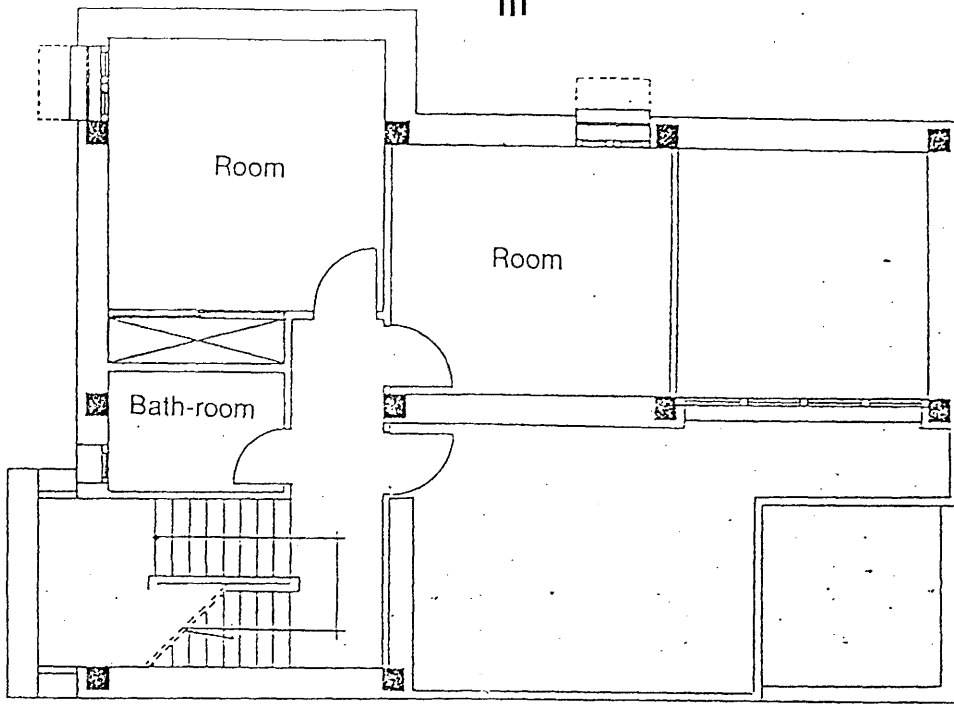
4 Bedrooms type, first-floor. Same ground-floor as (Fig.5-4-a).
